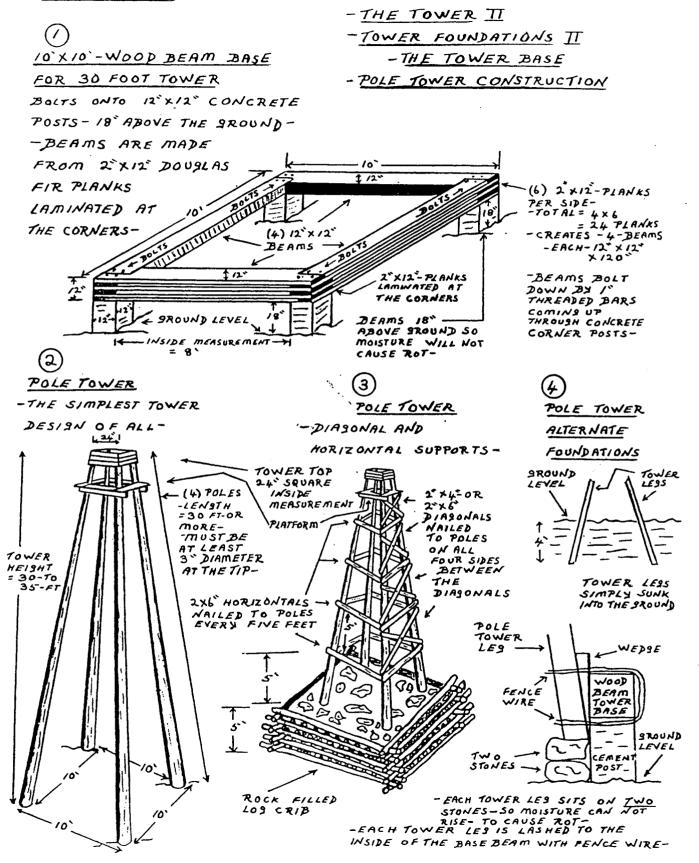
Five feet between horizontal makes a very strong tower. They can, however, be as much as
